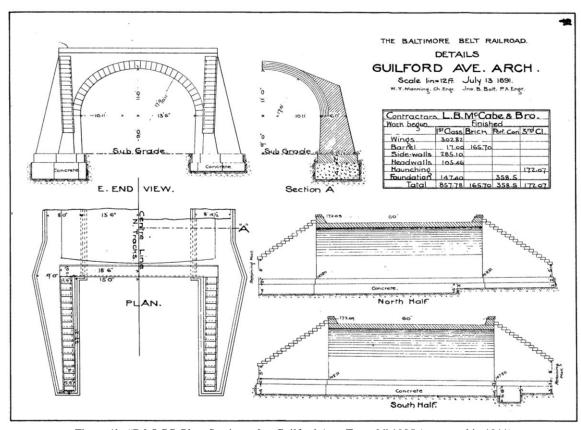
"B&O RR Plan, Sections, &c. Guilford Ave. Tunnel," 1905 (annotated in 1911).
